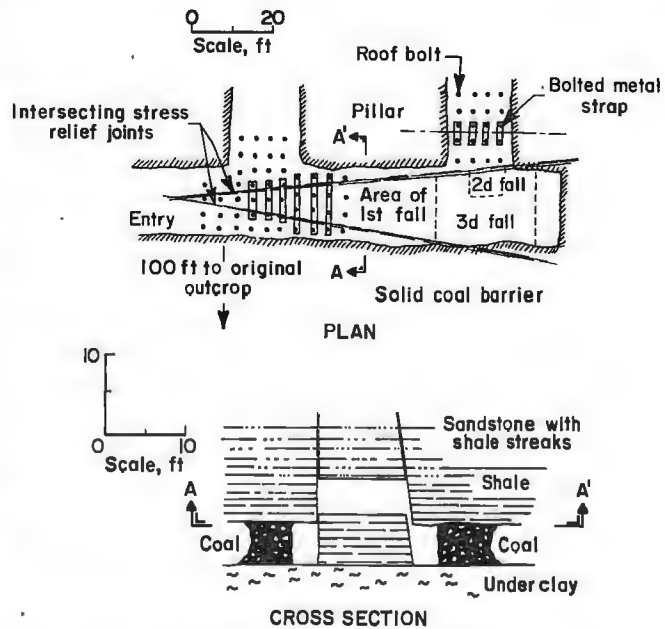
Plan and cross section views of roof fall caused by intersecting stress-relief joints.
